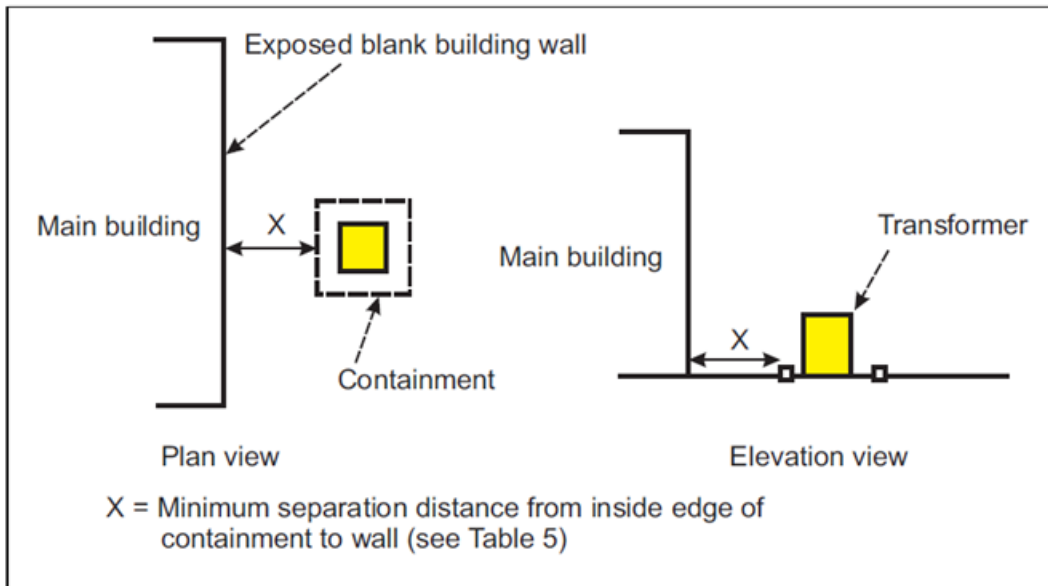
Minimum horizontal separation distance between outdoor liquid-insulated transformers and exposed walls of main buildings
